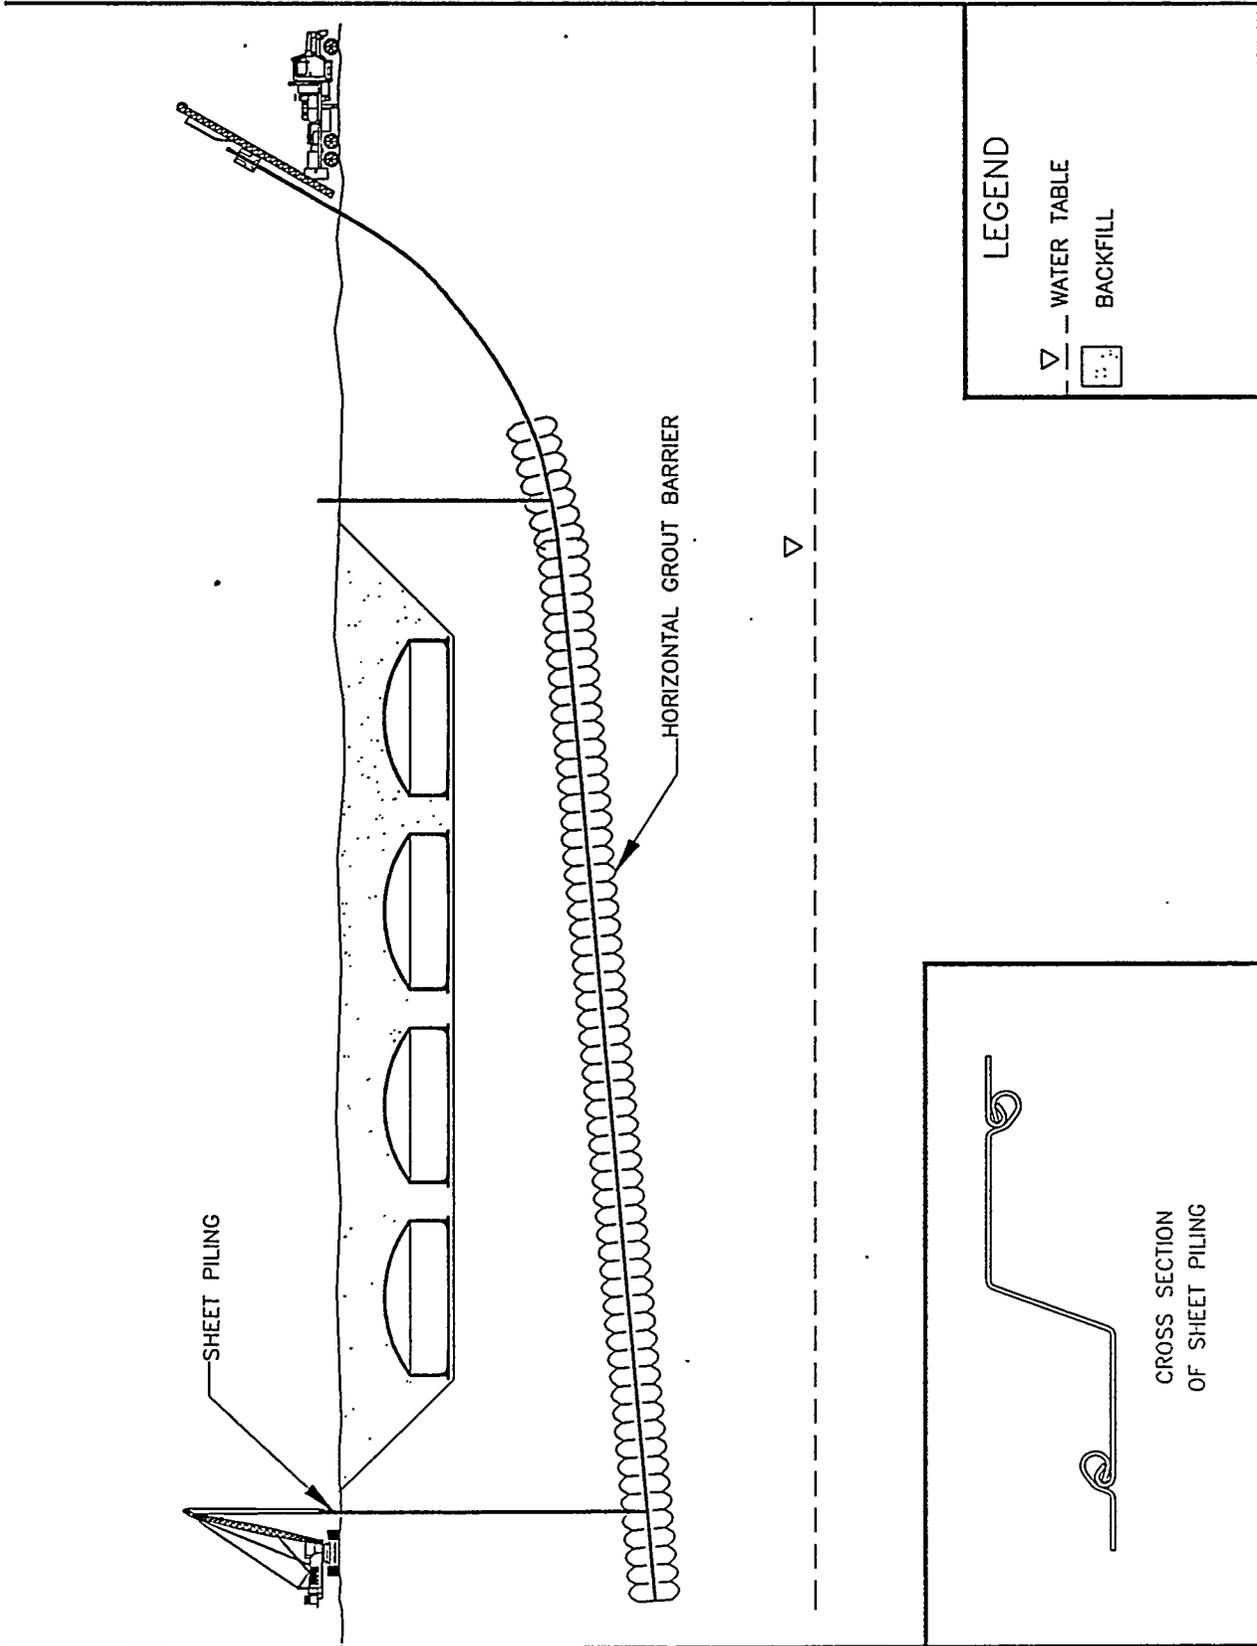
Sheet Metal Piling Subsurface Barrier.
